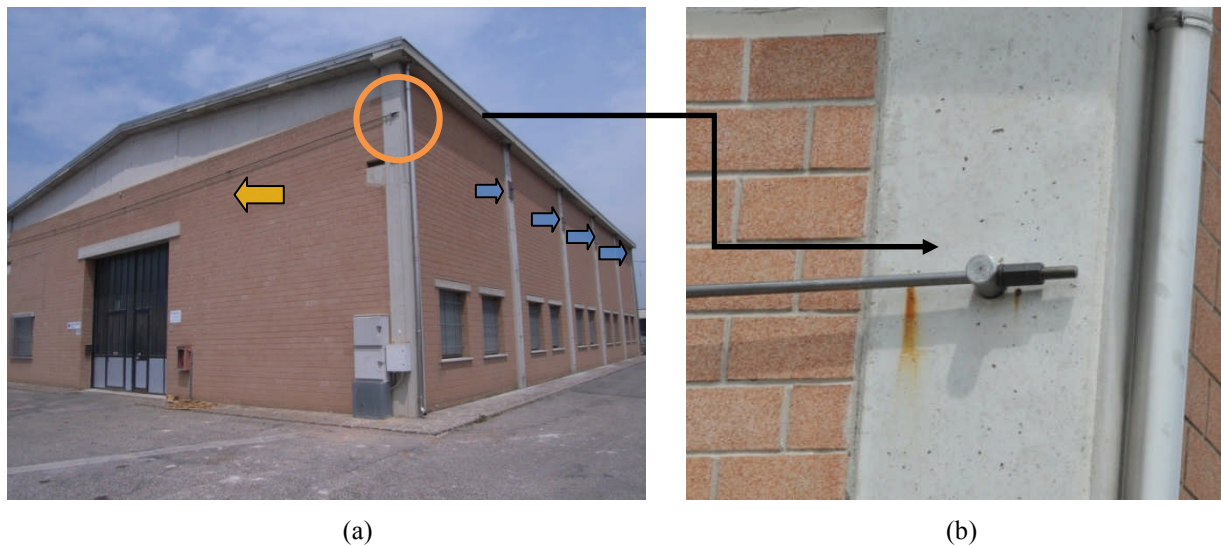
(a) Steel ties anchorage system installed after the main event to stabilize the structure: orange arrow showing the external tie, blue arrows showing the internal ties. (b) Detail of the anchorage at the external tie.
